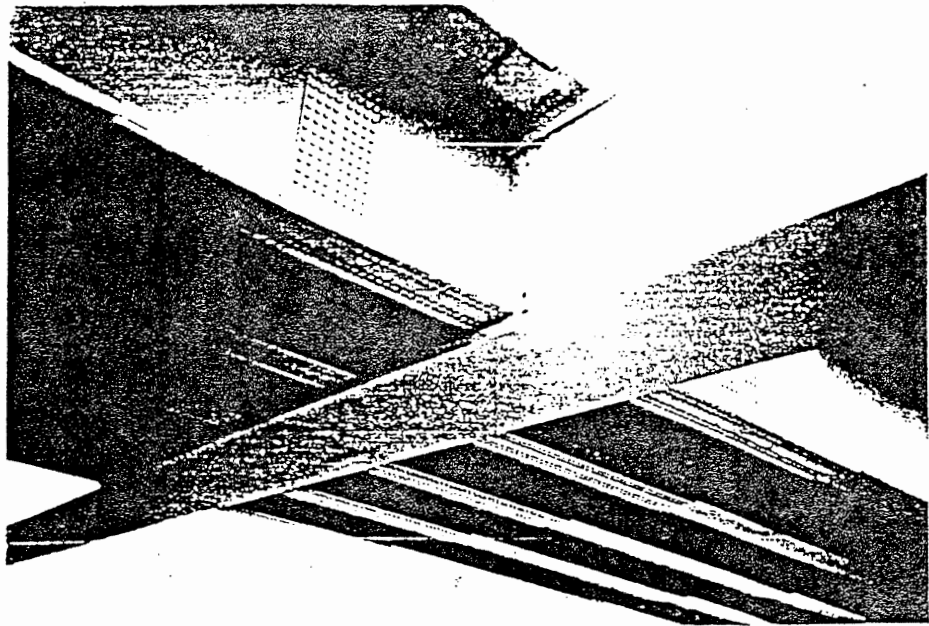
Box girder design with holes drilled at fatigue crack initiation points.
